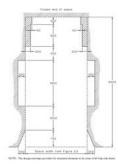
DESIGN ENVELOPE AROUND PARKED VEHICLE TO BE KEPT CLEAR OF COLUMNS, WALLS AND DISTRUCTIONS
